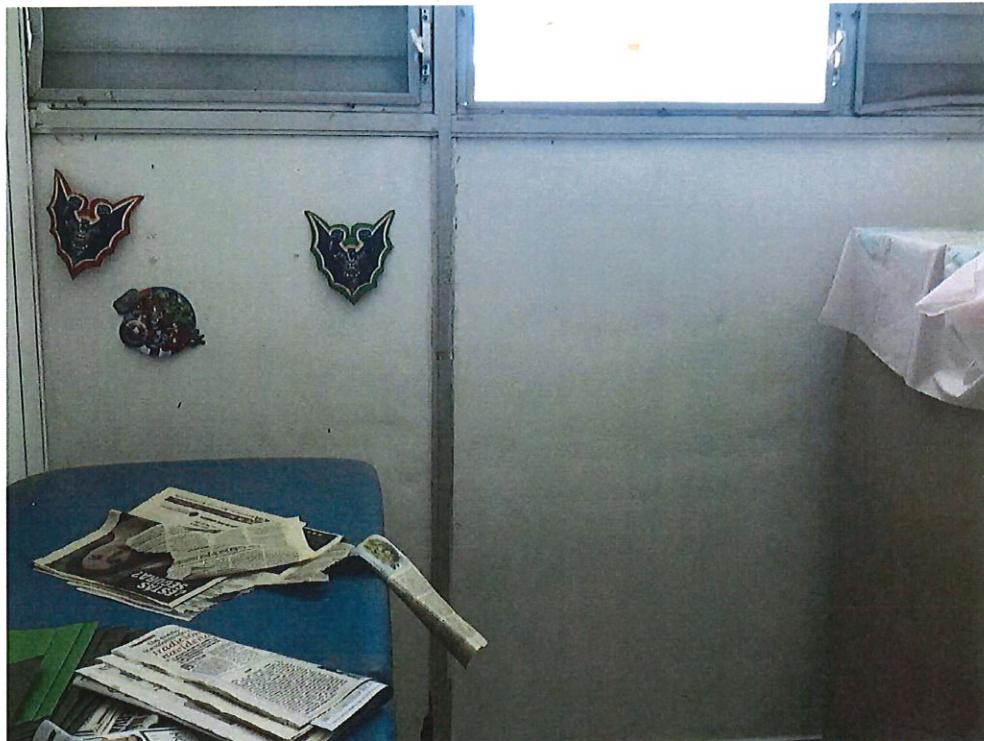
Wall Interior “A” Exam & Treatment Room (70C)
